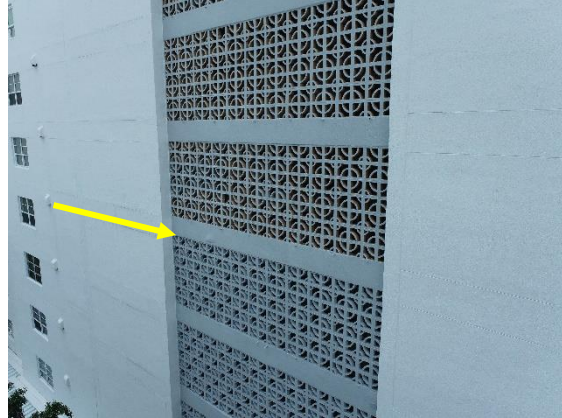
Overall Photo of Exterior Showing Damaged Stucco
